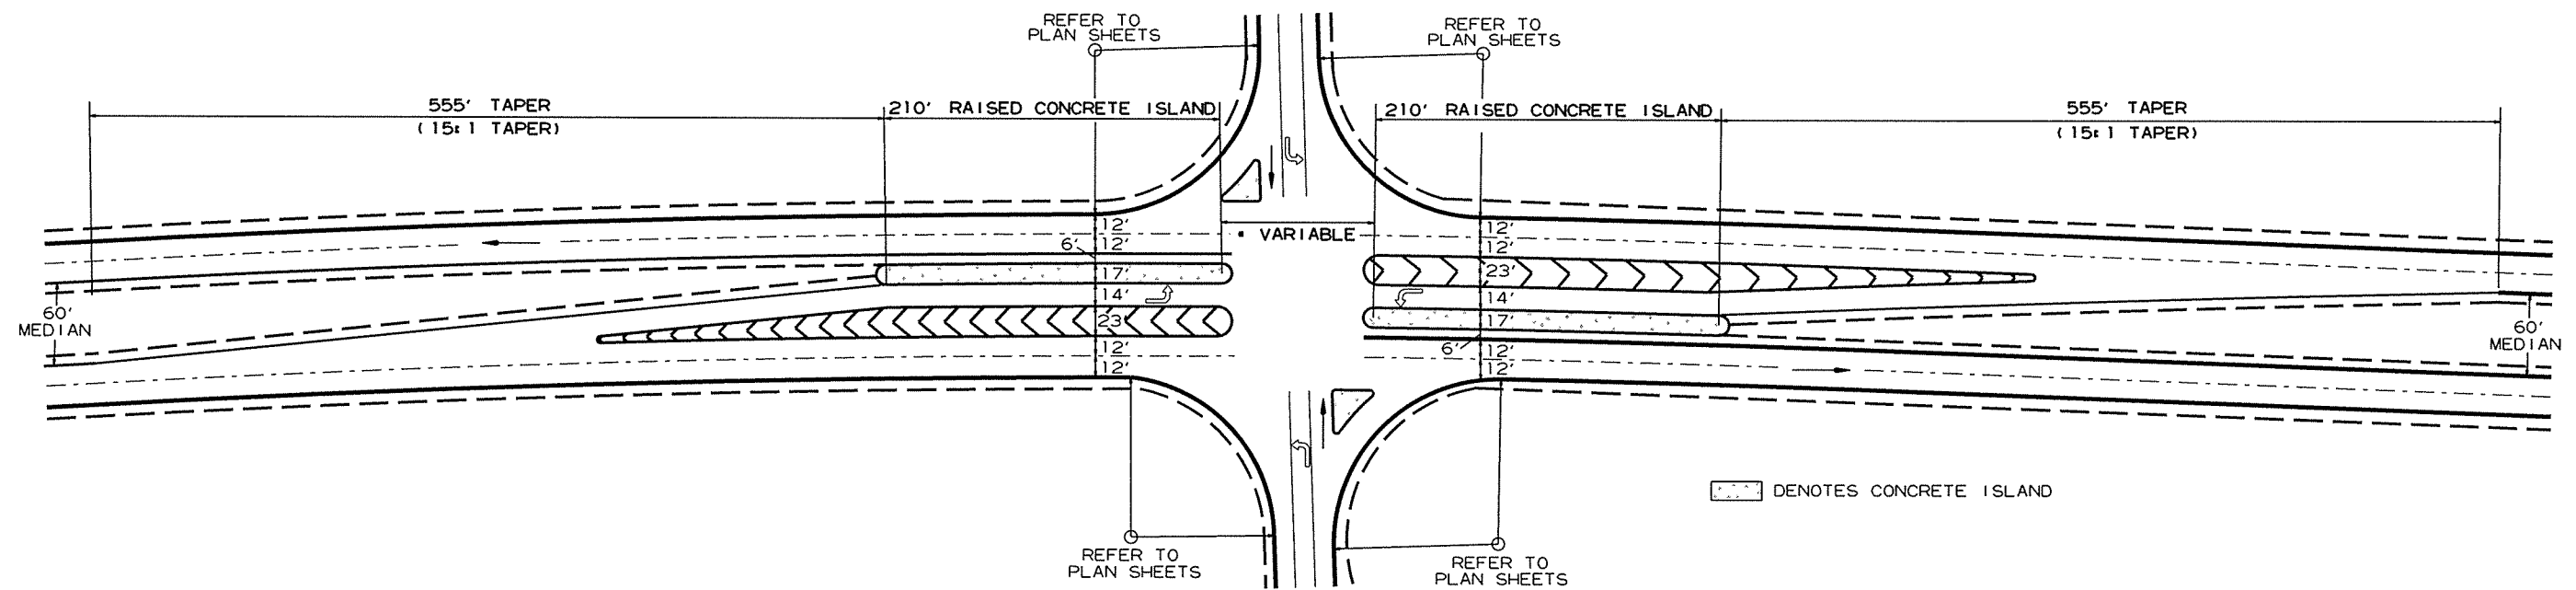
DETAIL OF HIGHWAY OR COUNTY ROAD CROSSING
